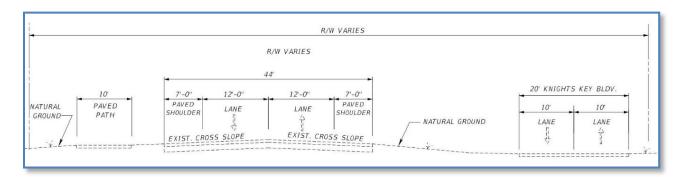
Typical Section: Roadway Farther East of Figure 3-6
